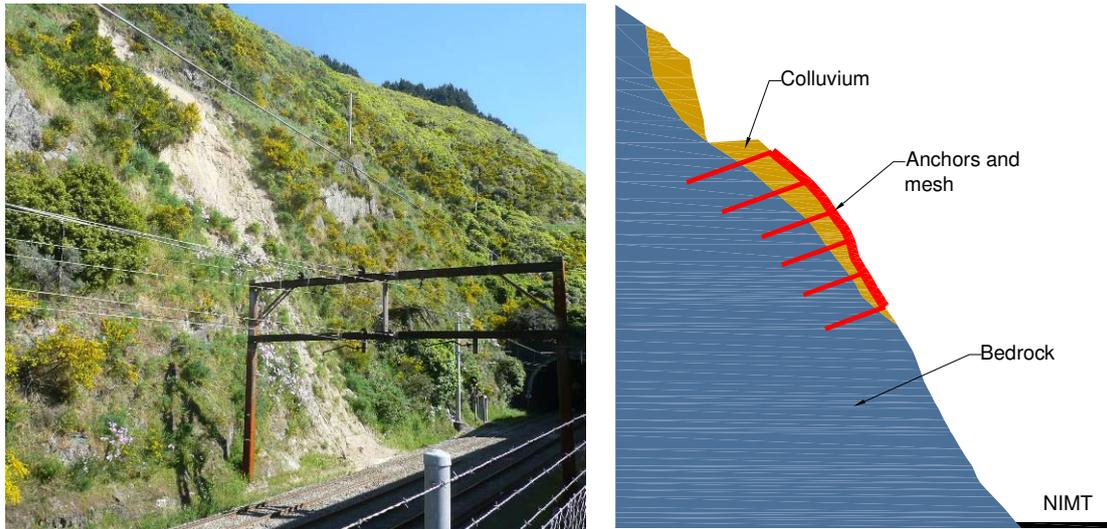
The slope at Tunnel 2 on the NIMT: (a) site photograph and (b) schematic cross section
